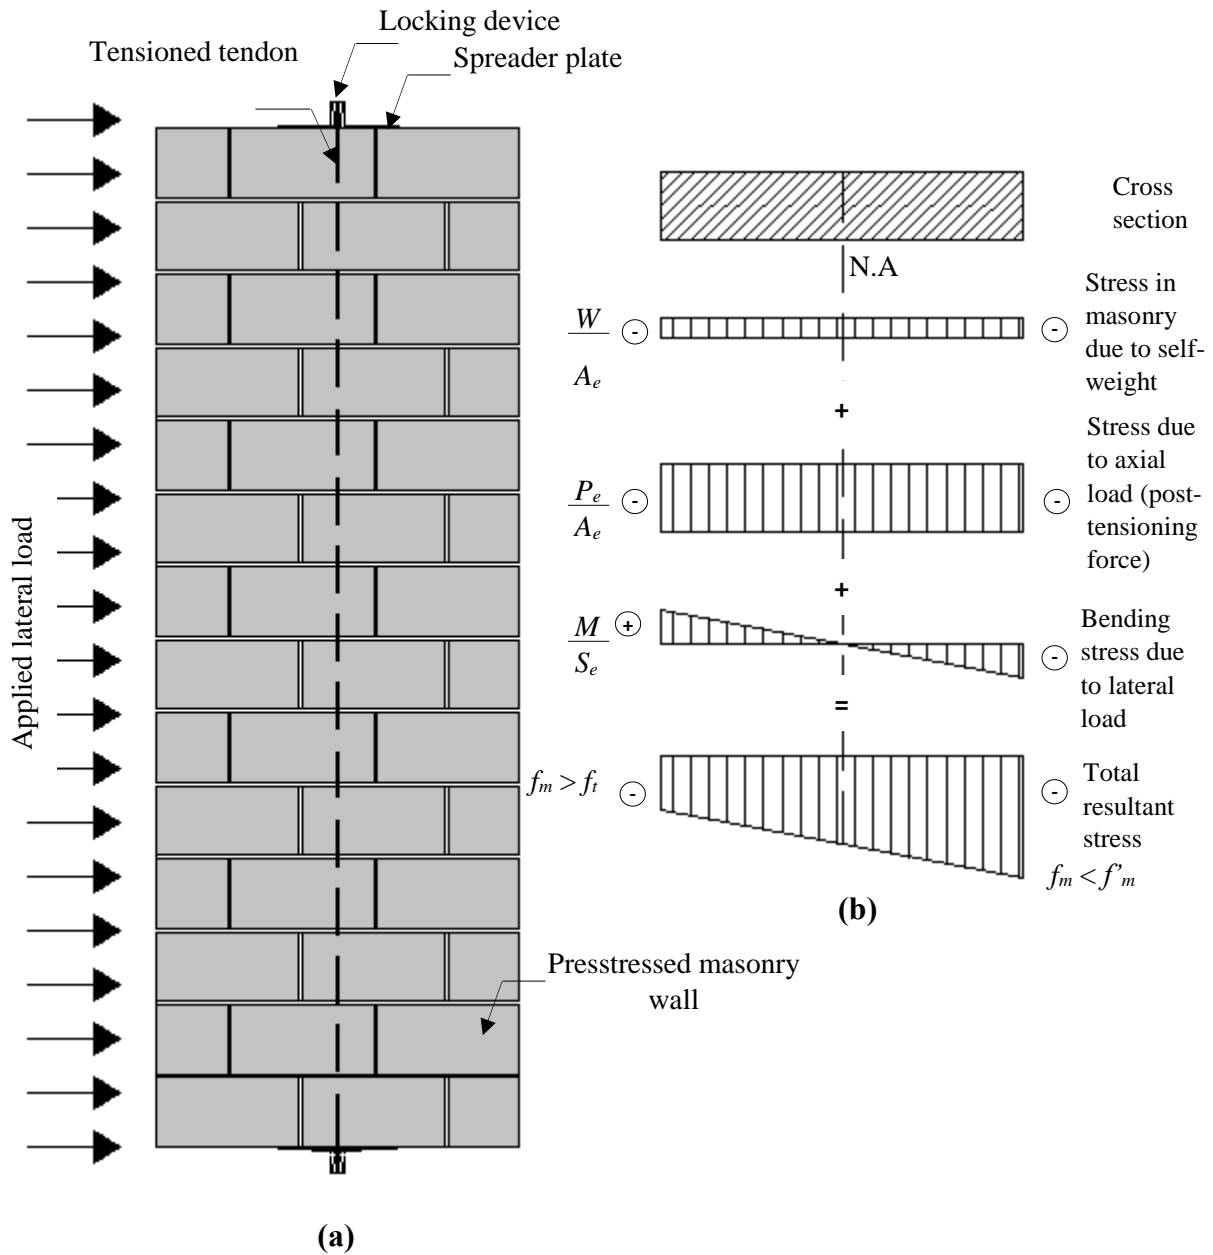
Prestressed masonry wall: (a) wall showing a prestressed tendon that is anchored at its ends using a locking device, (b) stress distribution in the masonry wall section (based on Curtin et al. 1989).
